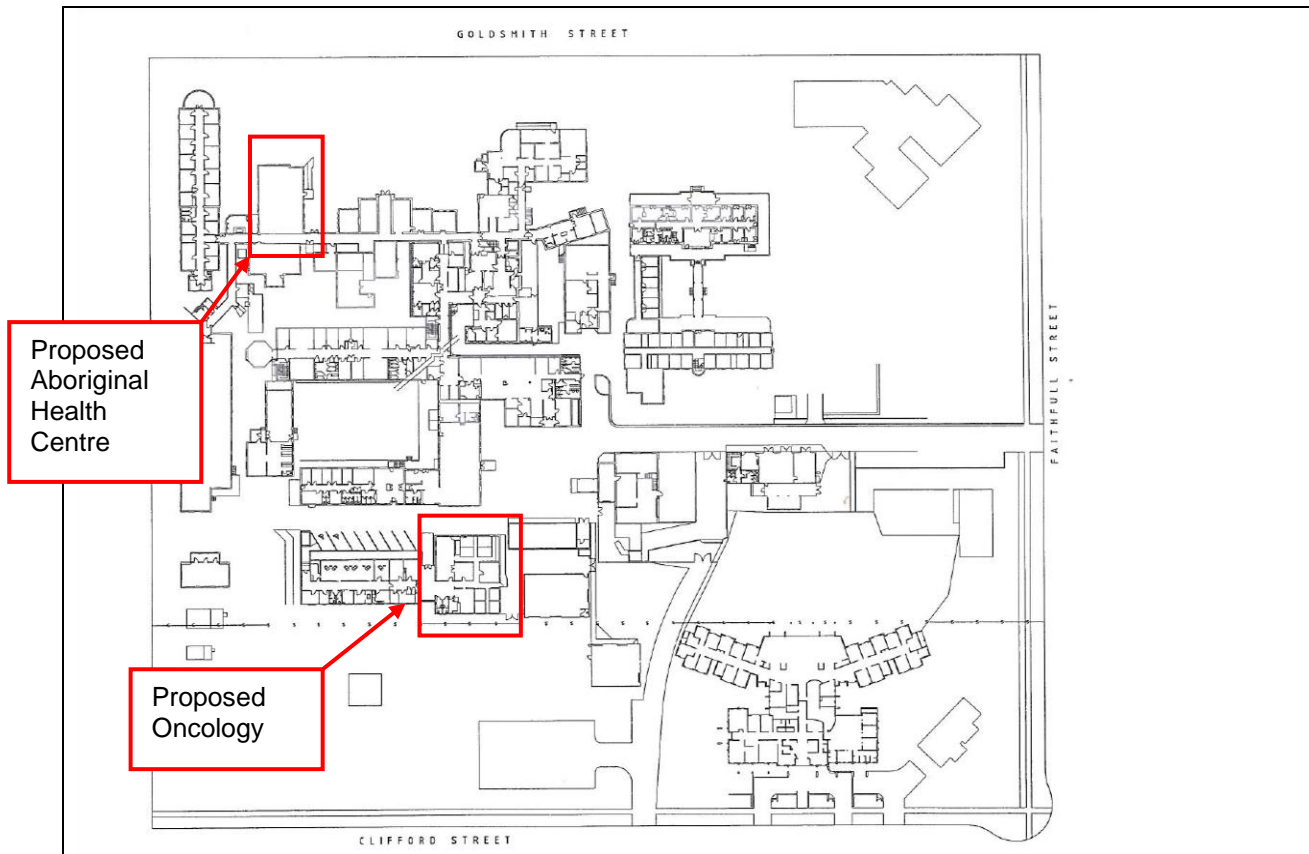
Site plan at 2005. (GBH, SNSWLHD)
